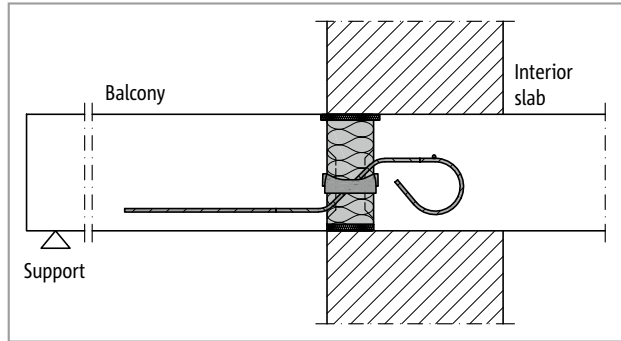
Schöck Isokorb® T Type CQ: Connection with thermal insulating cavity masonry (e.g. T Type CQ-V1 to T Type CQ-V5)
